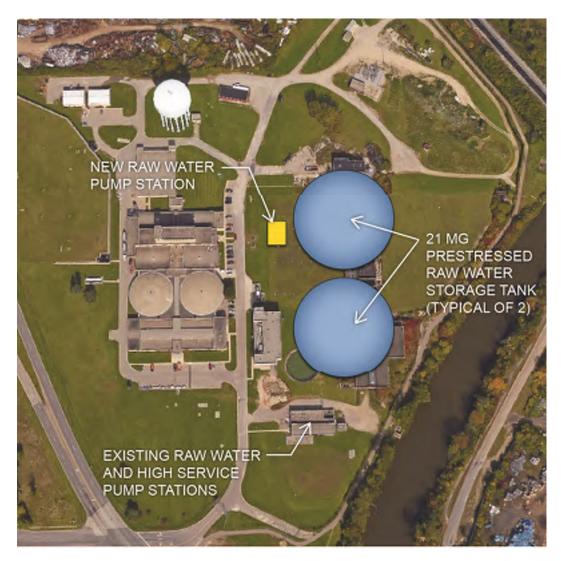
Open Top Prestressed Concrete Tanks Plan View
